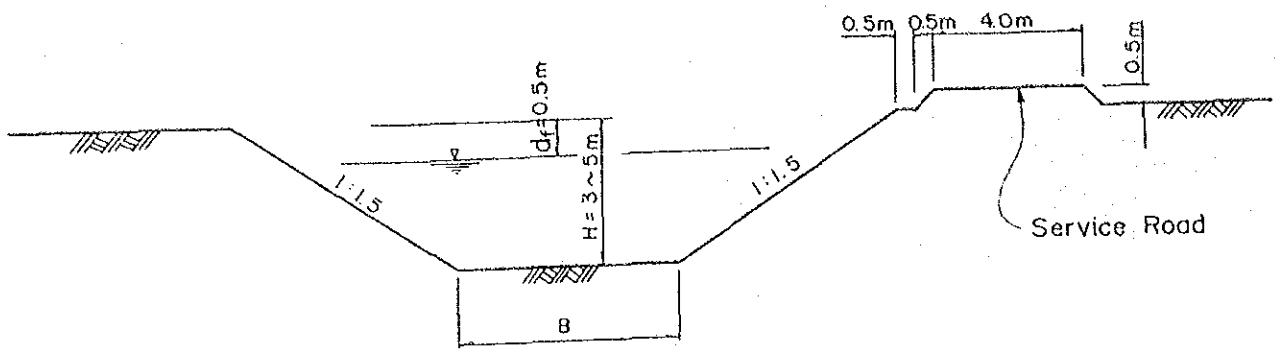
Proposed Cross Section of Principal Drainage Canal
